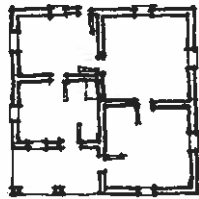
The Pyramidal. Floor plan from the Tenth Street Historic District.
